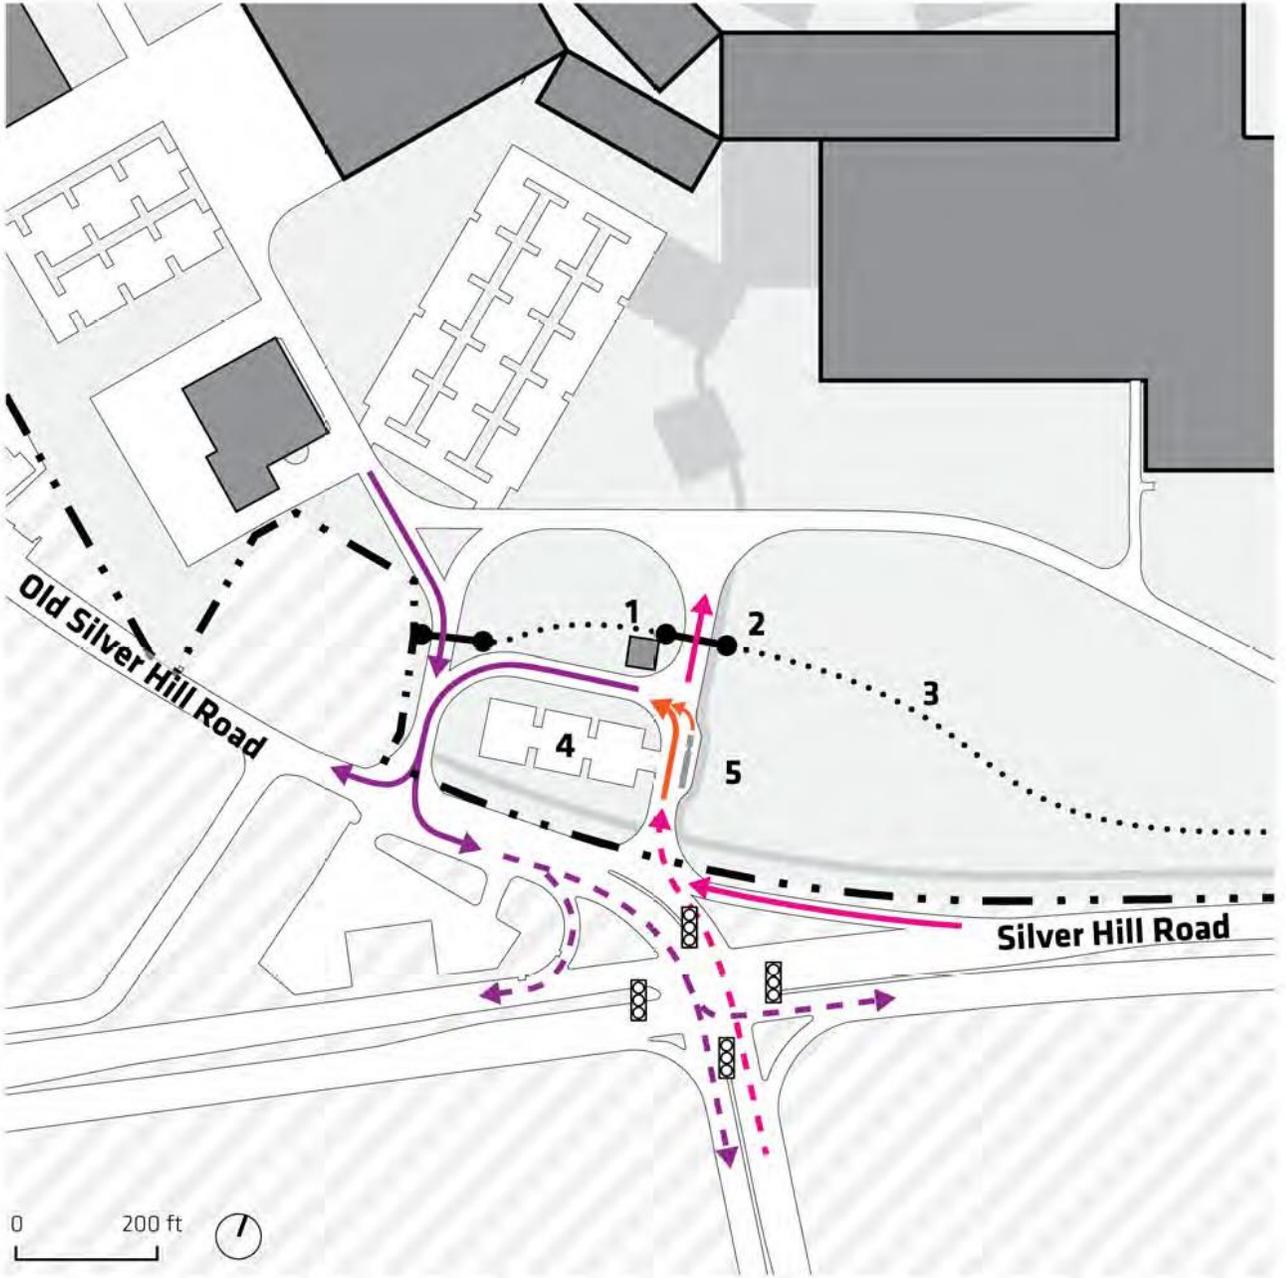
Proposed Site Plan: Campus Entrance and Circulation
